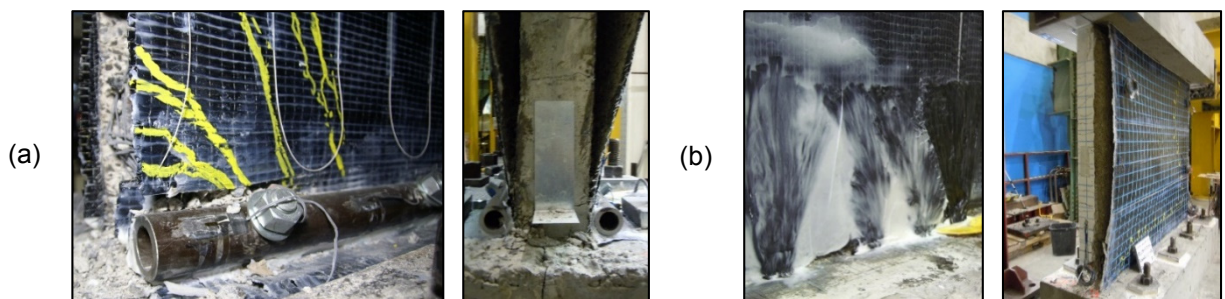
Anchor system performance: (a) tube anchor; (b) CFRP/GFRP fan anchors.
